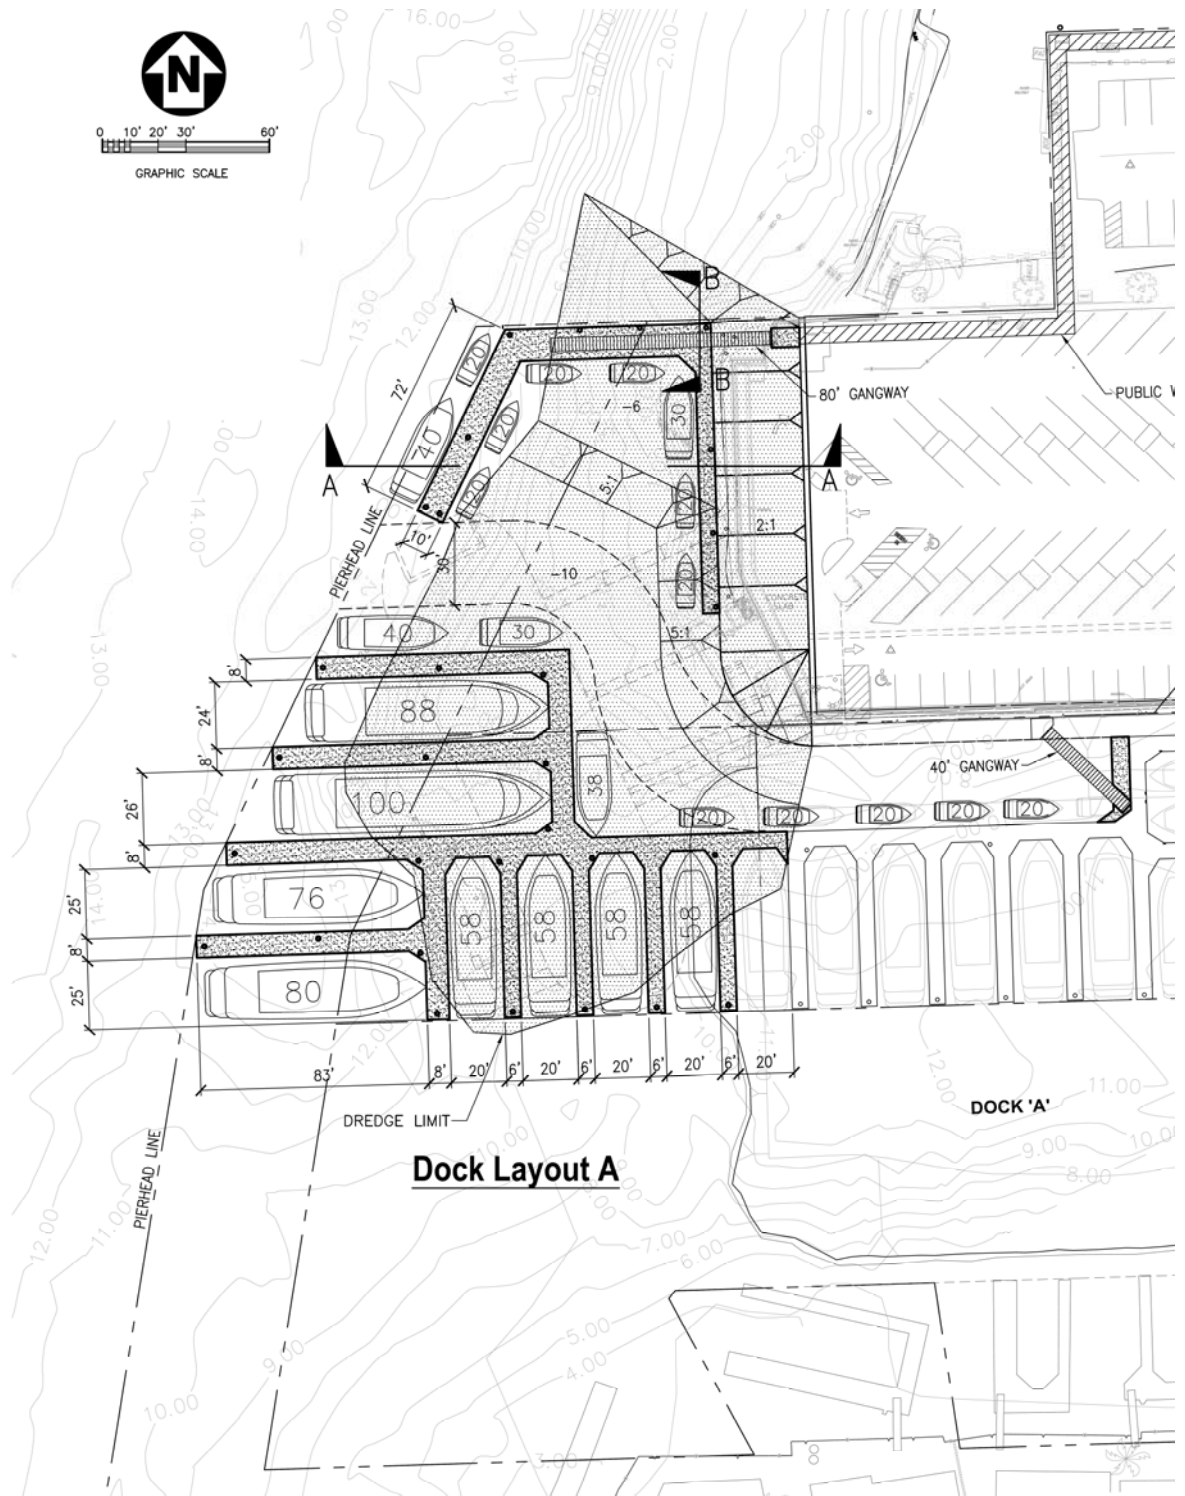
Dock Layout for Alternative 1A (With Seawall and Groin Wall)
